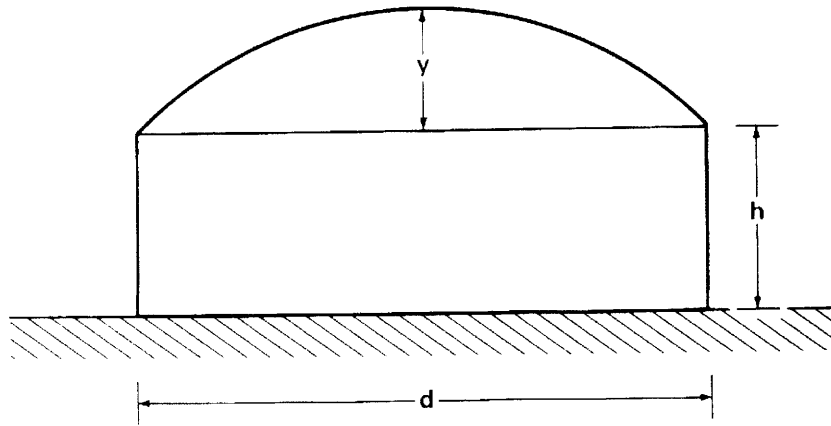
Elevation Schematic of Dome (Newberry, 1974)
